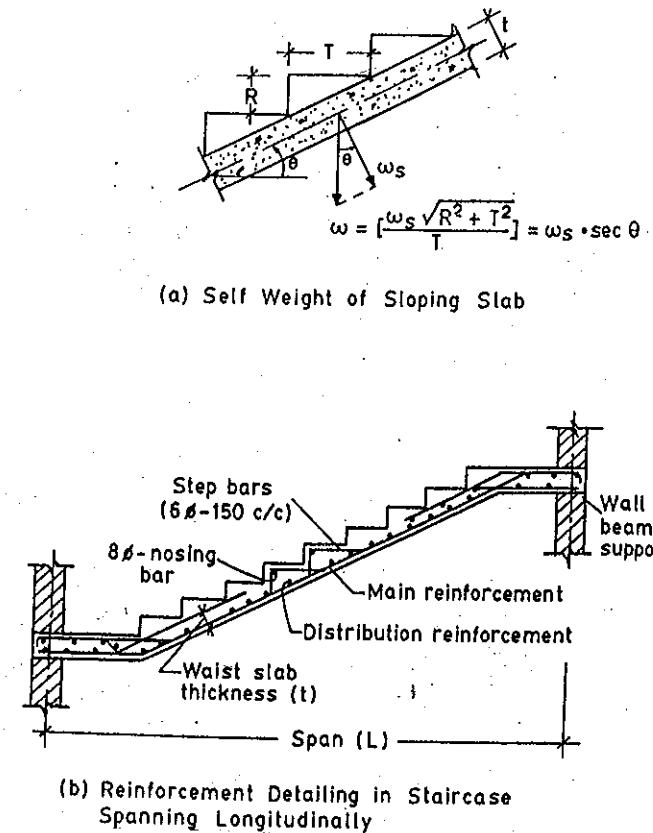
Load Effects and Detailing in Waist Slabs
